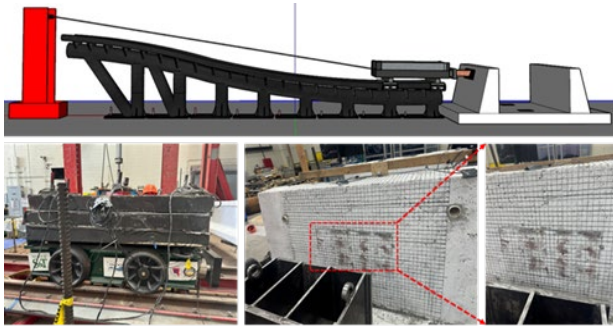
Impact test of GFRP reinforced concrete bridge barriers.
